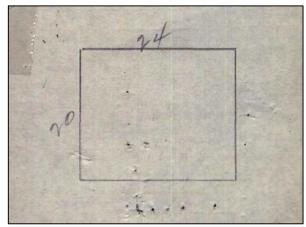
Original dimensions of the residence at 827 El Centro Street (City of South Pasadena 1924a).
